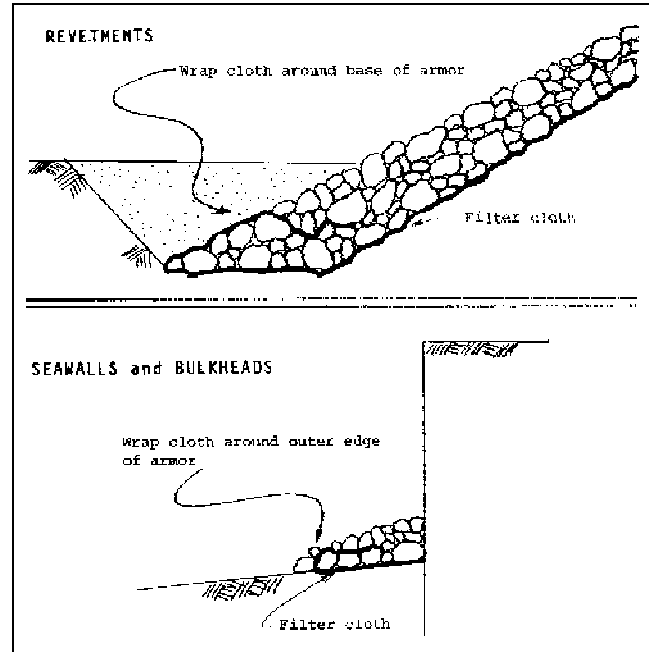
Use of filter cloth under revetment and toe protection stone
